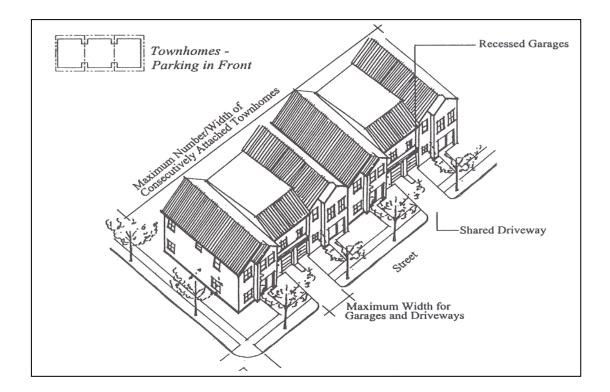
E(2) - Townhomes and Multiplex Housing With Street Access
